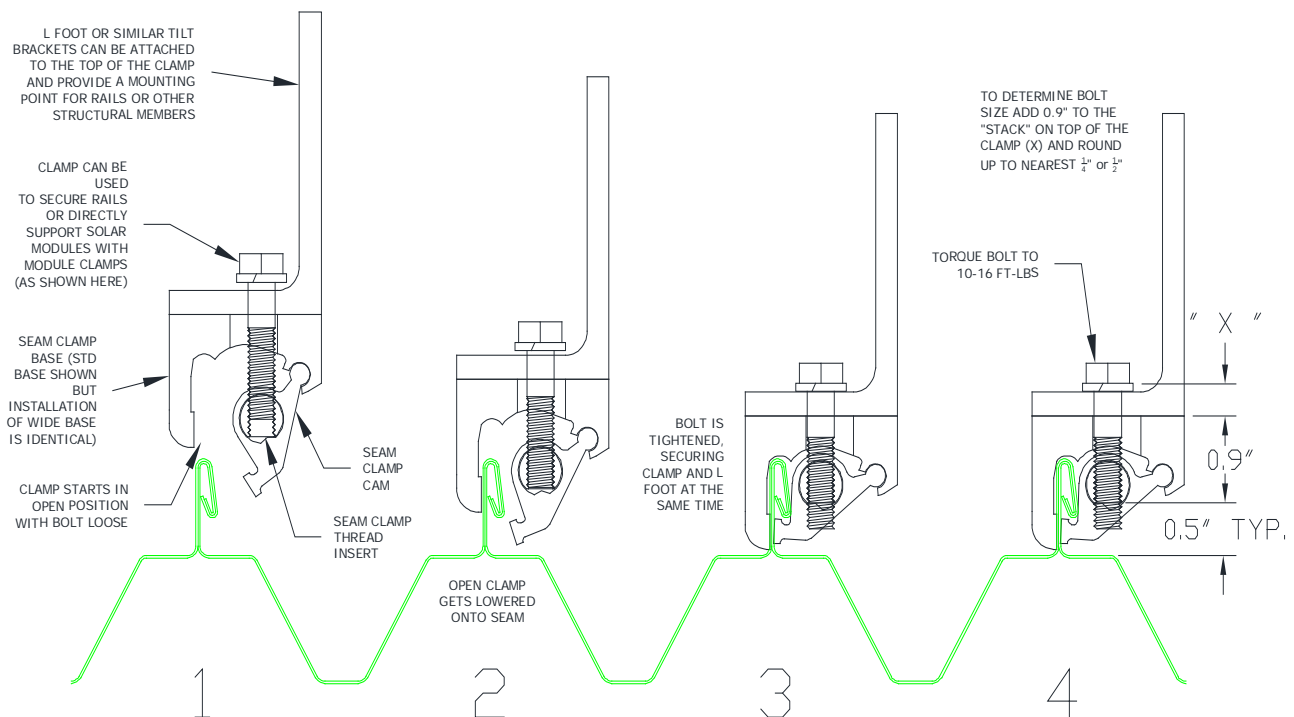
Standing Seam Metal Roof Clamp Detail
